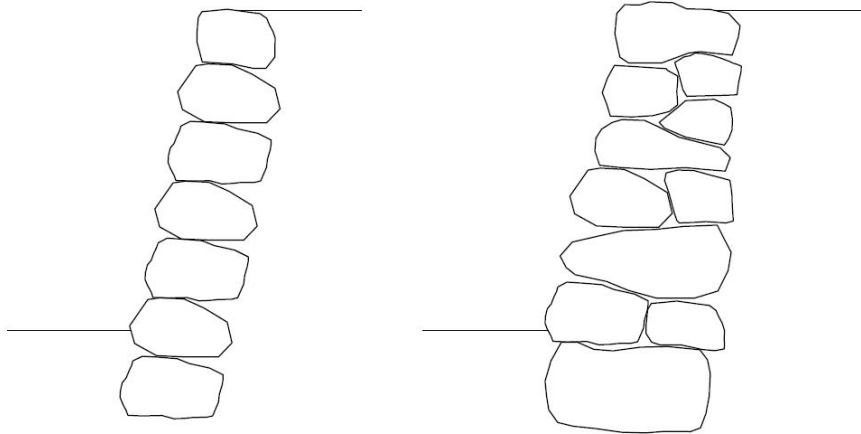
Schematic sketch of single row and multi row, Natural Rock Wall
